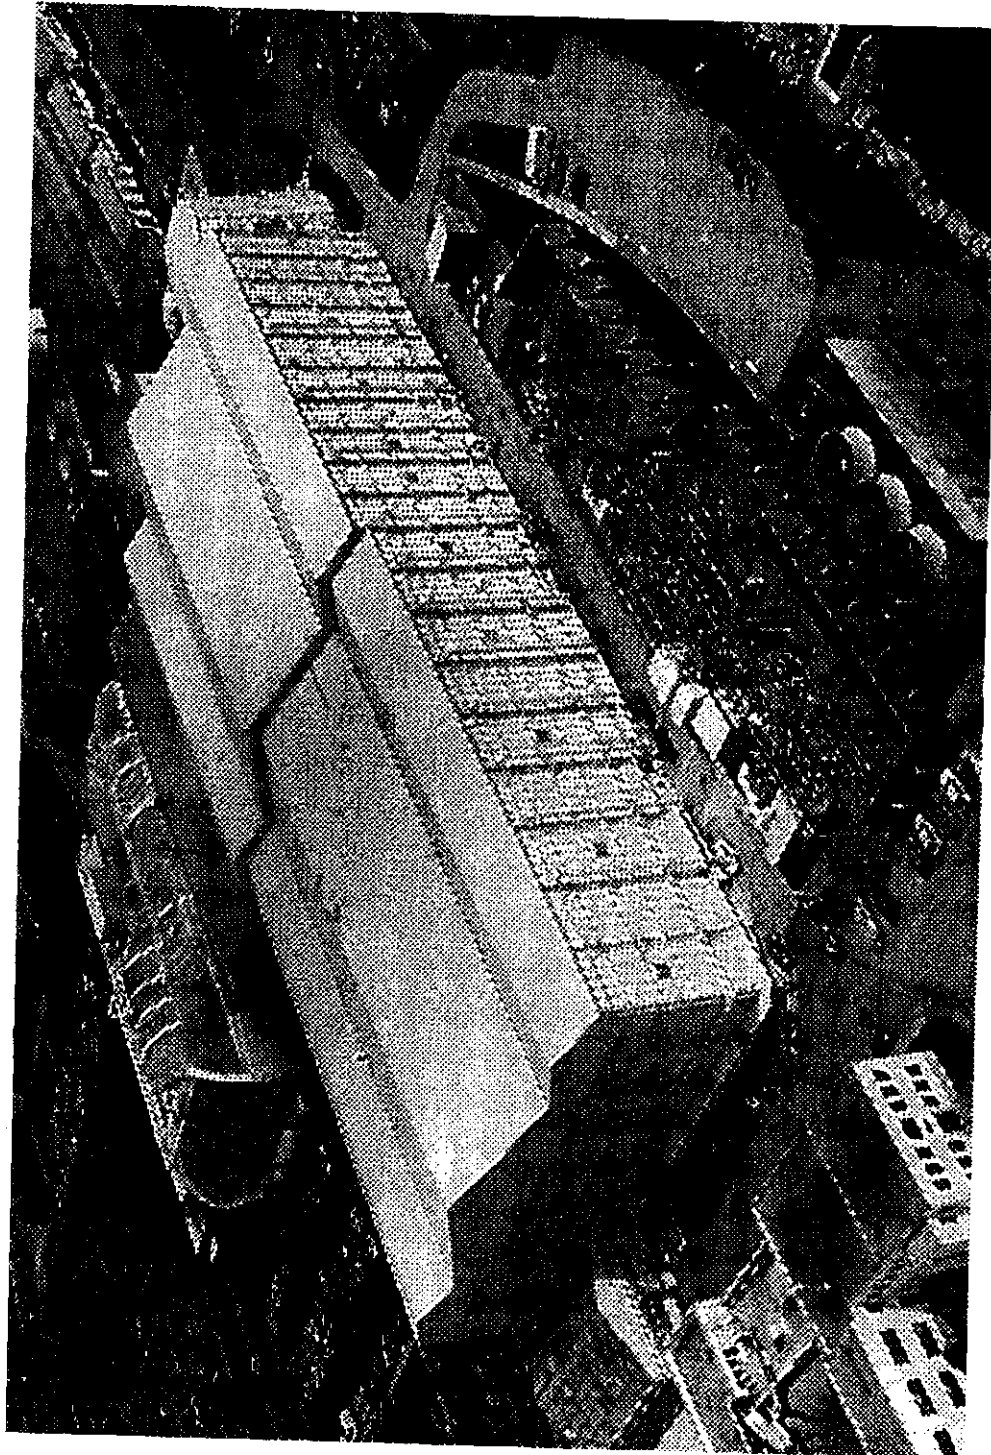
Aerial view northwest of the Full-Scale Wind Tunnel - 1989
